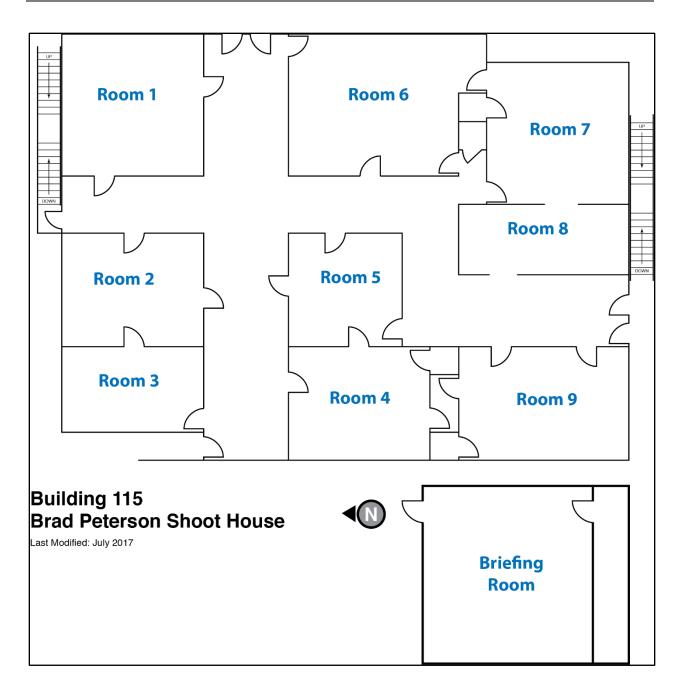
Layout and Features of NTC Live Fire Shoot House, Building 115
